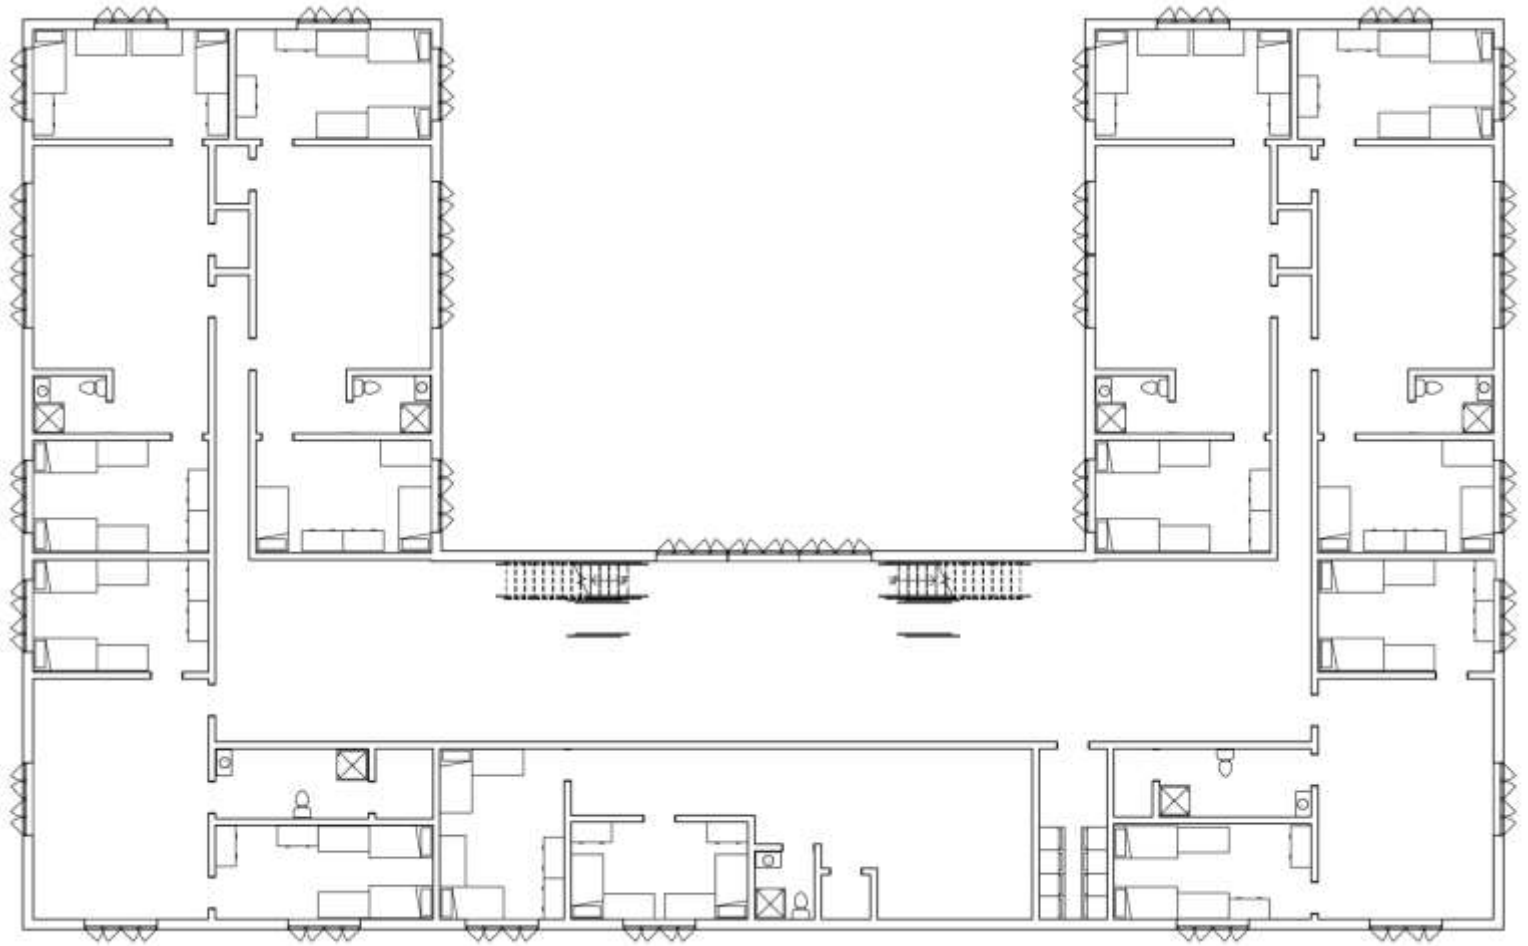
Second through Fourth Floor Plan of Multipurpose Building
